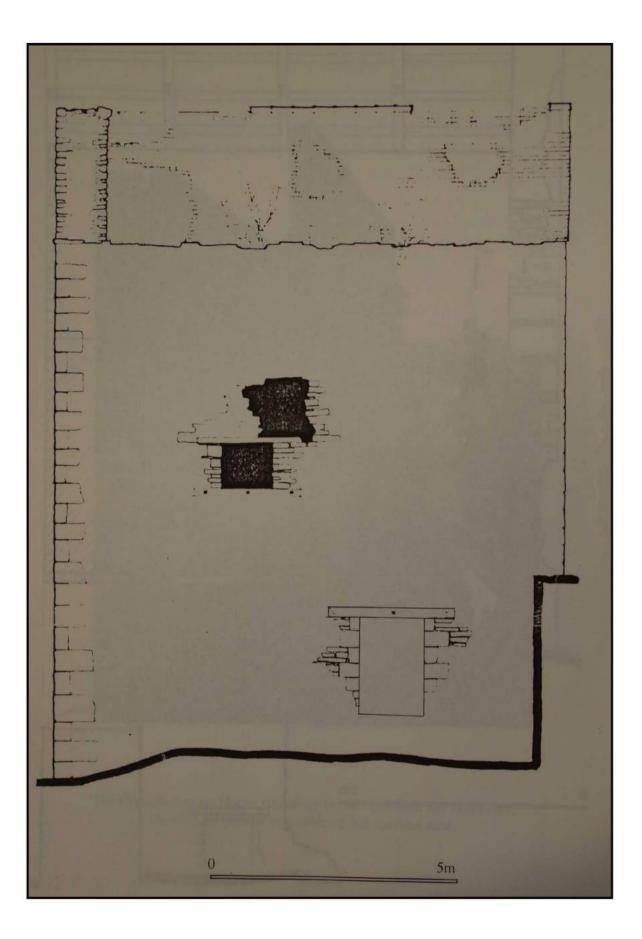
Cornish engine house; north elevation, Snailbeach, after Morriss 1997
